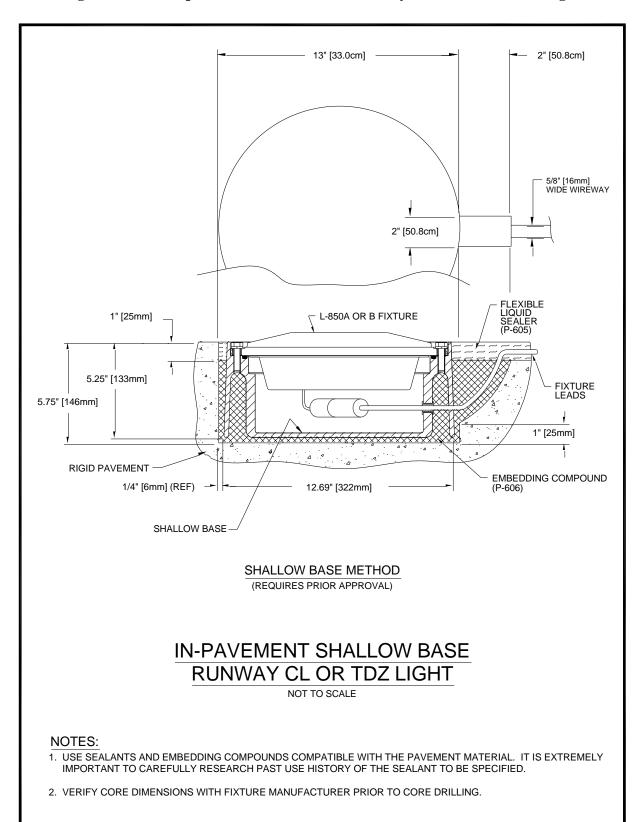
In-pavement Shallow Base Runway Centerline or TDZ Light
